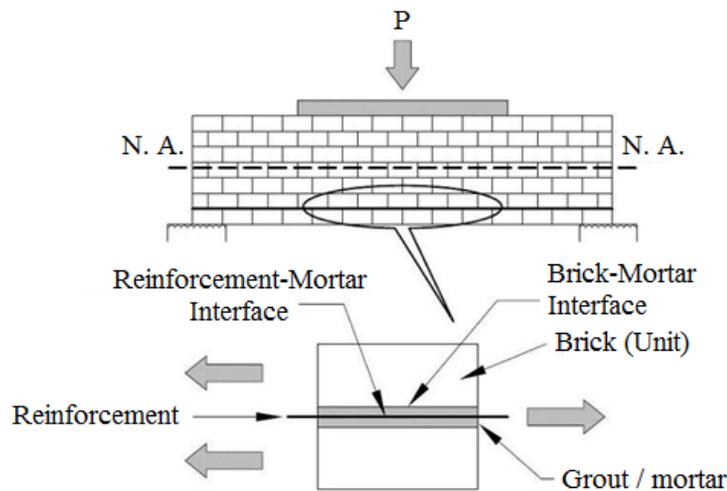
Typical reinforced masonry beam and reinforced masonry joint details.
